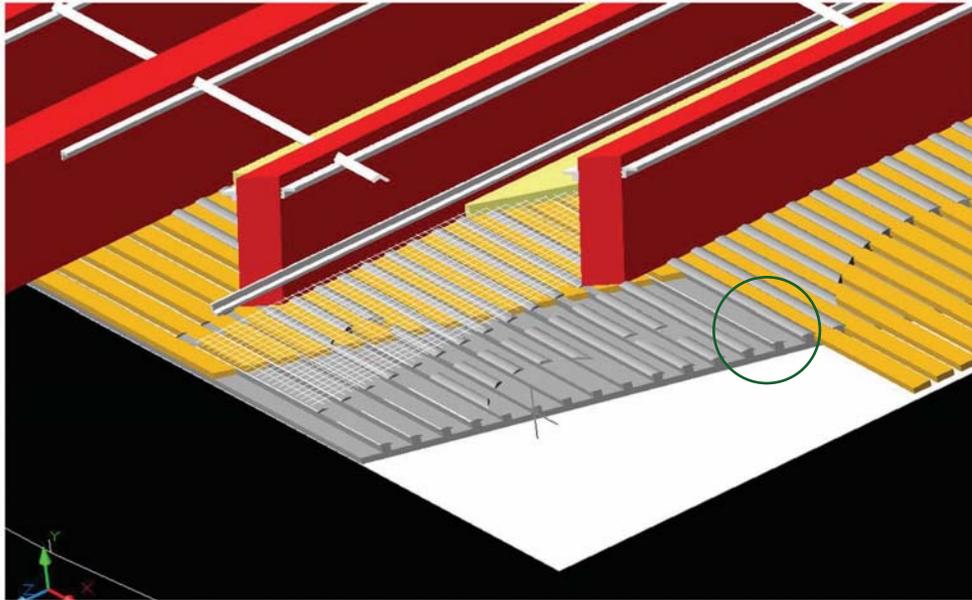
A: Schematic isometric view of existing floor-ceiling system (view from above)
